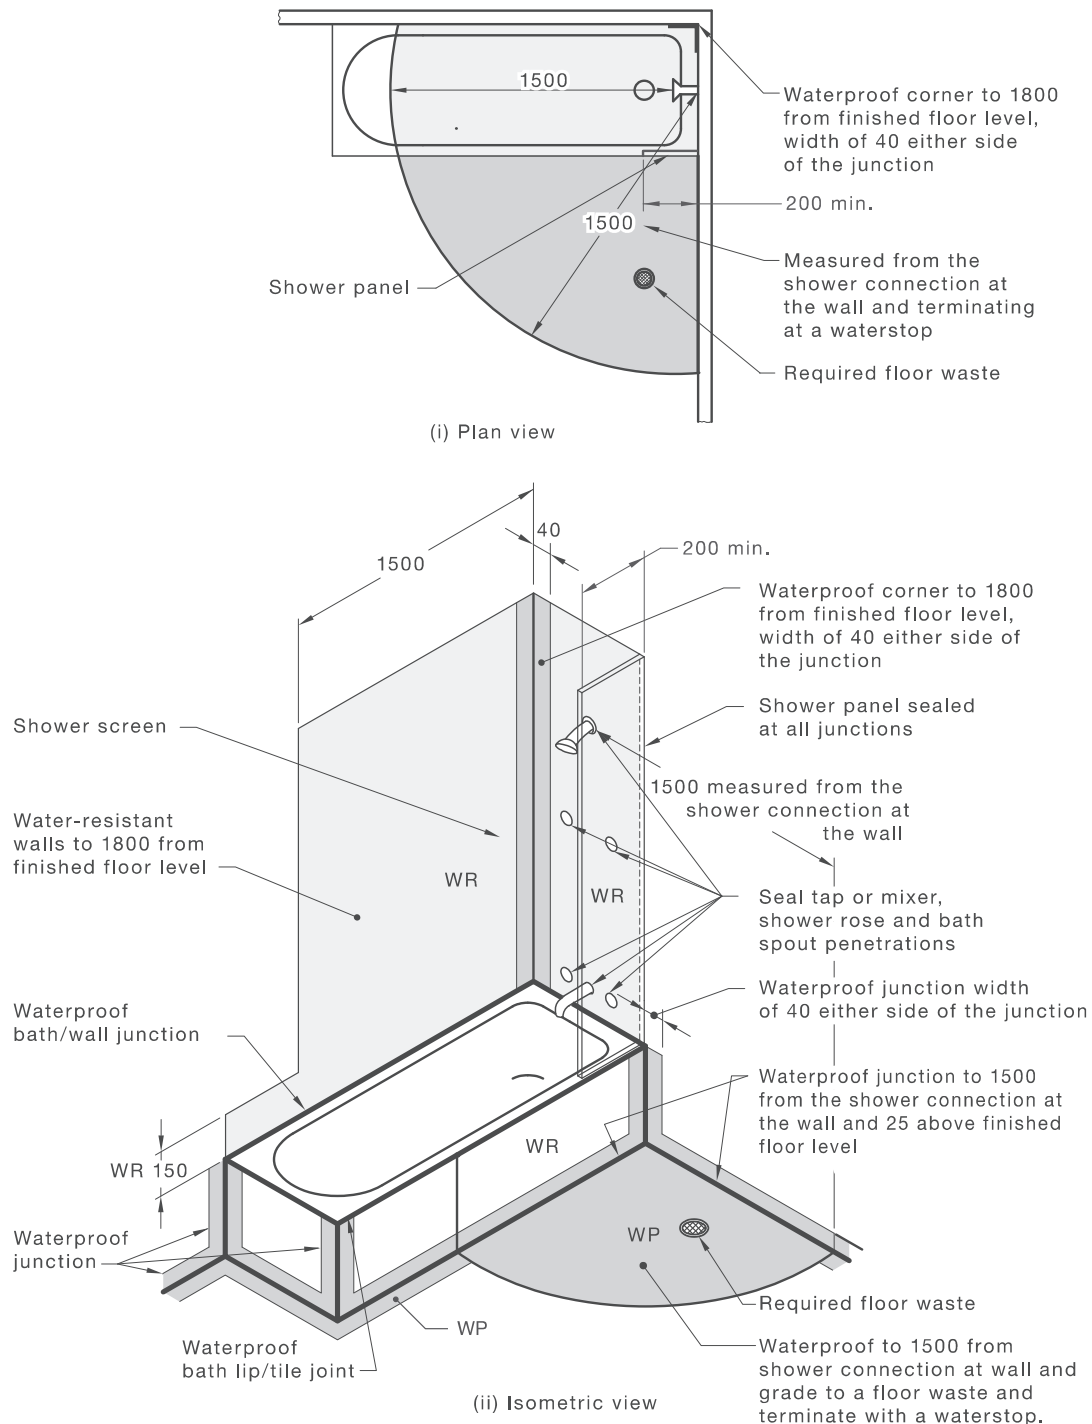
(in part) UNENCLOSED SHOWERS ABOVE BATHS—AREA PROTECTED FOR CONCRETE AND COMPRESSED FIBRE-CEMENT SHEET FLOORING
